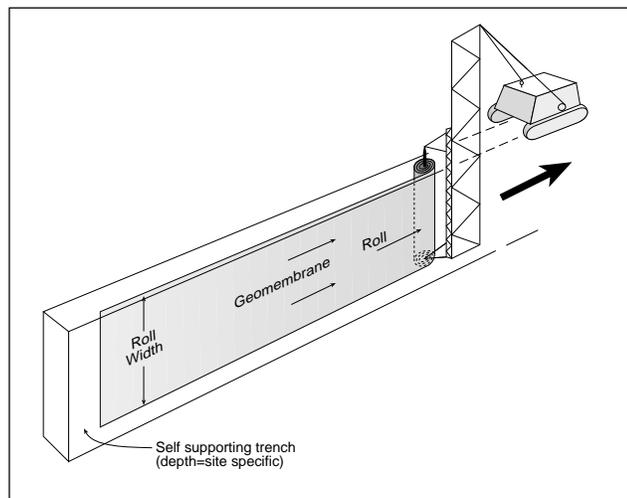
Continuous geomembrane in self-supporting trench excavated by a trenching machine
